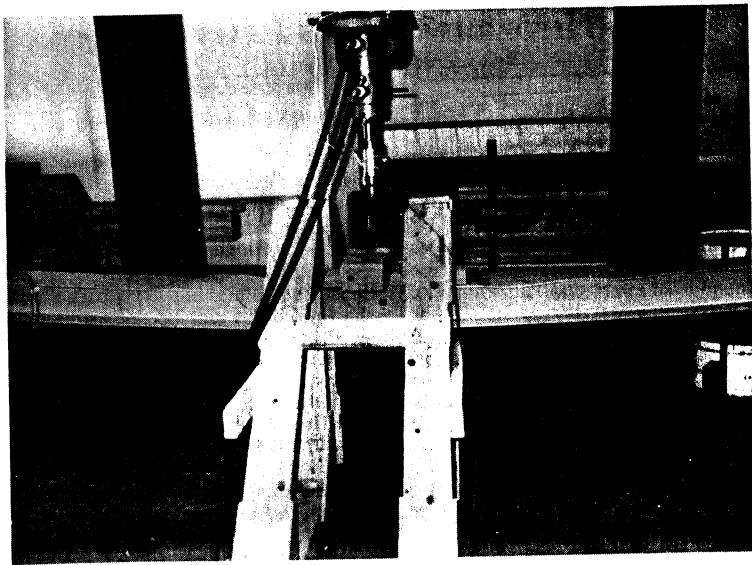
Bending of FRP Beam Showing Buckled Top Flange
